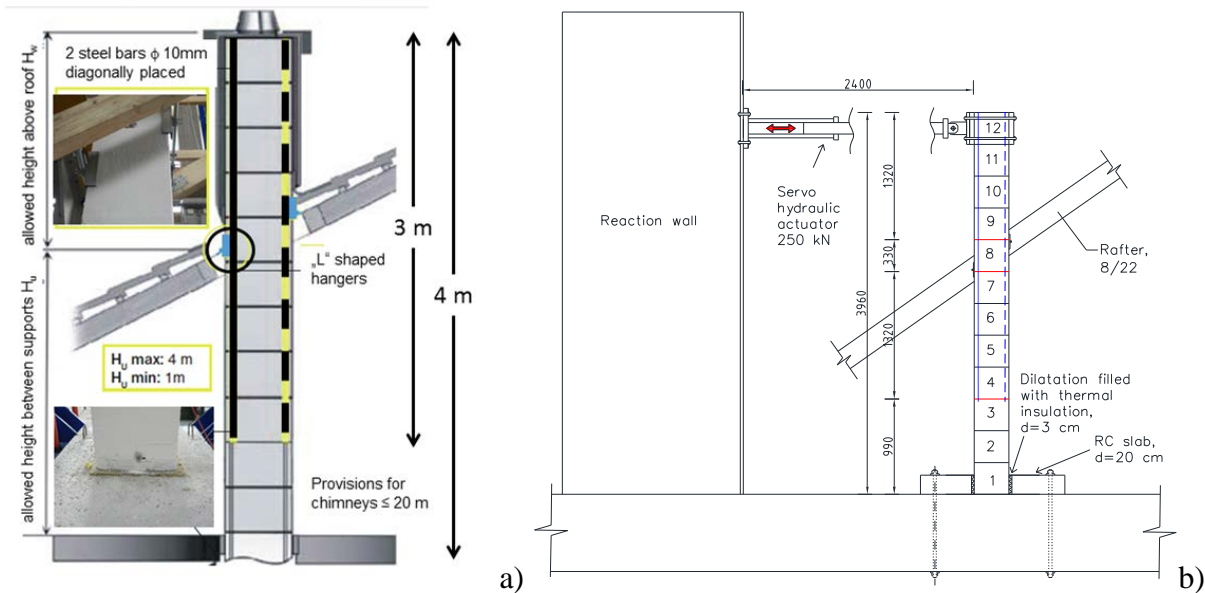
Reinforcement for chimney systems type A and B, lateral support system of the chimney at the roof level and detail of connection through RC slab a), test set-up for laboratory testing b).
